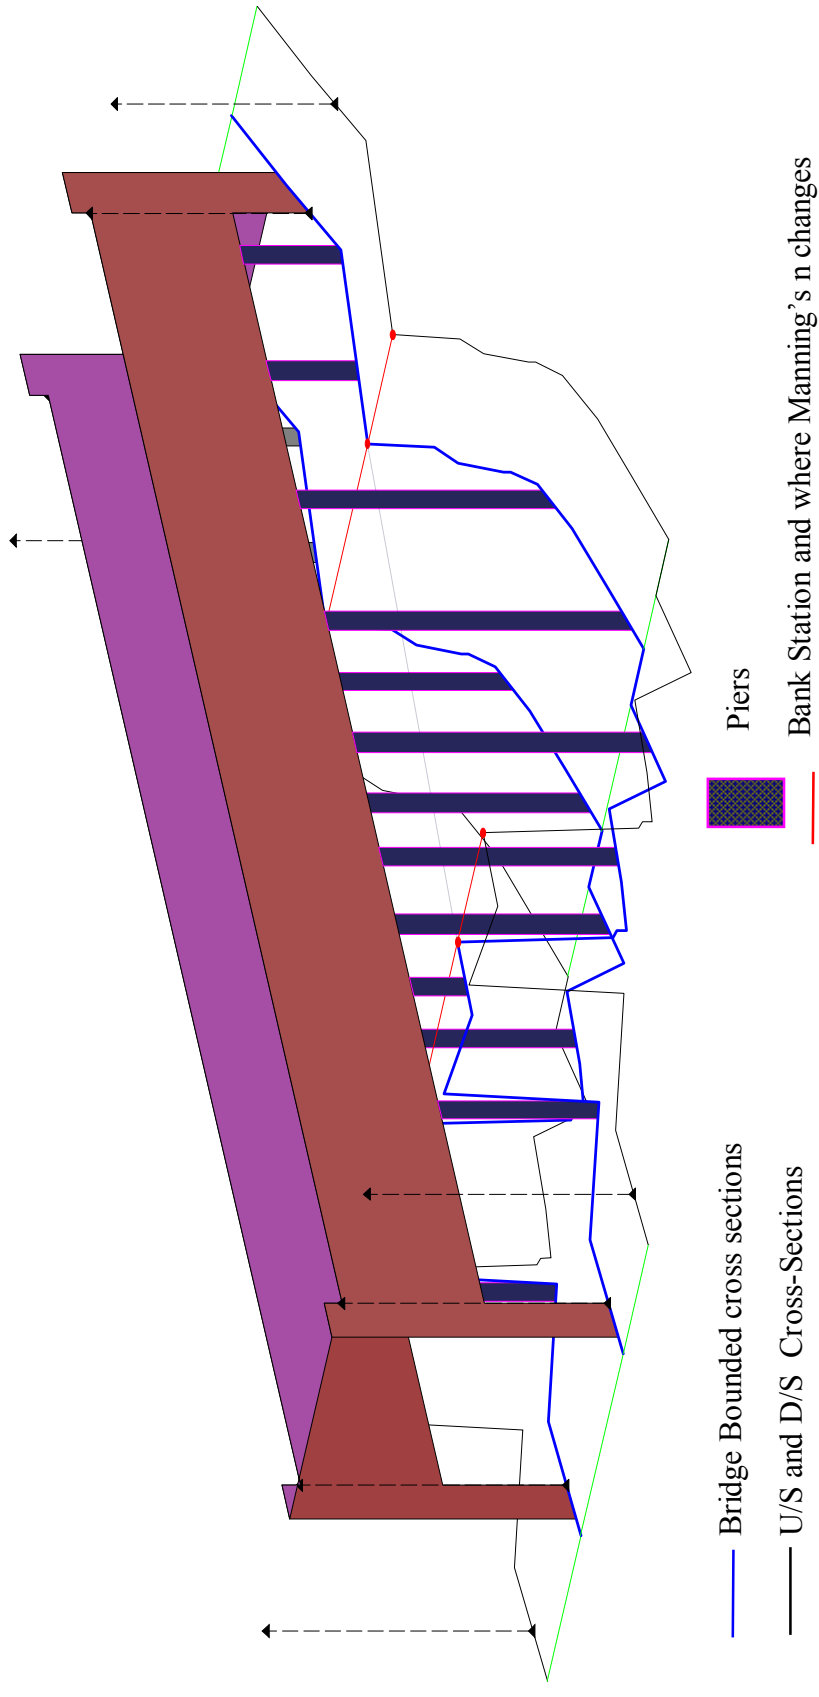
Three-dimensional view of a Railway Bridge with its bounding cross-sections (station 1606- 1582)
